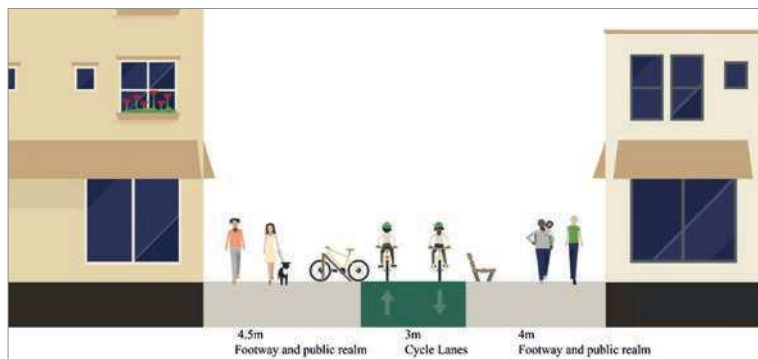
High Street Indicative Proposals (narrow cross section) (© Street Mix)
